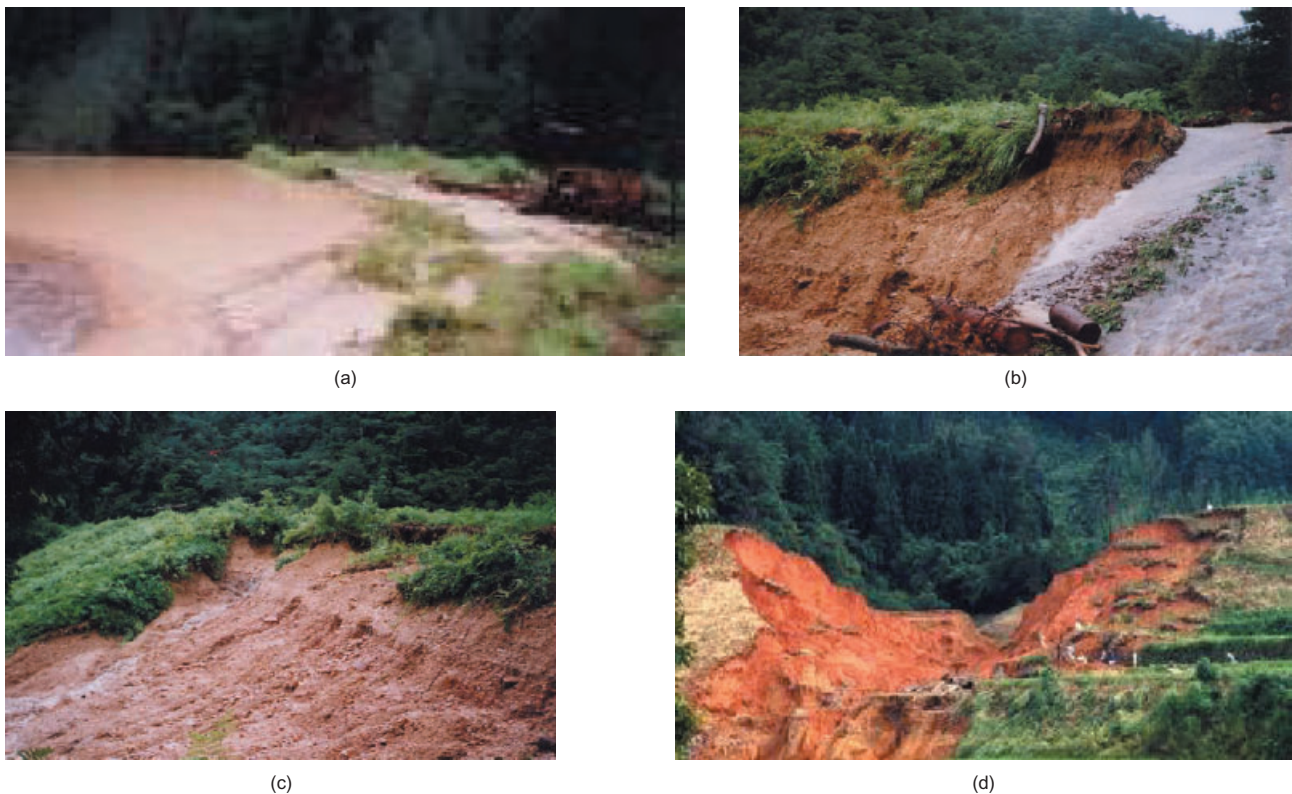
Erosion of downstream slope by overflow and progression into failure of slope: (a) upstream water level; (b) overflow; (c) downstream slope failure by sliding; (d) total failure
